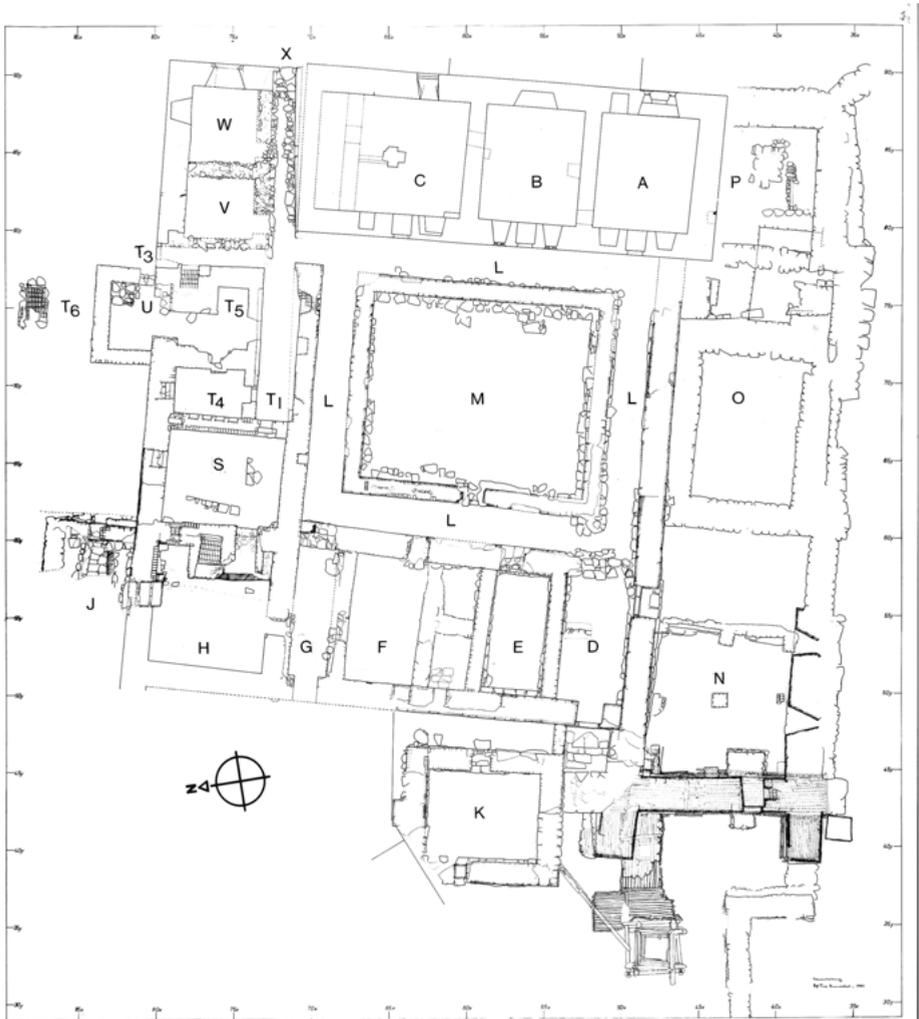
Oslo. St Óláfr's Dominican Friary. The ground plan with all surveyed building parts. The building parts interpreted as from a failed royal building project by King Hákon IV are found in the south-west (N and south of K). Drawing: A. T. Hommedal after drawings produced 1924–74 by G. & D. Fischer, C. Enger, B.C. Lange, O. Ø. Svendsen, and H. Braathen. After Hommedal (1986:ill. 8).
